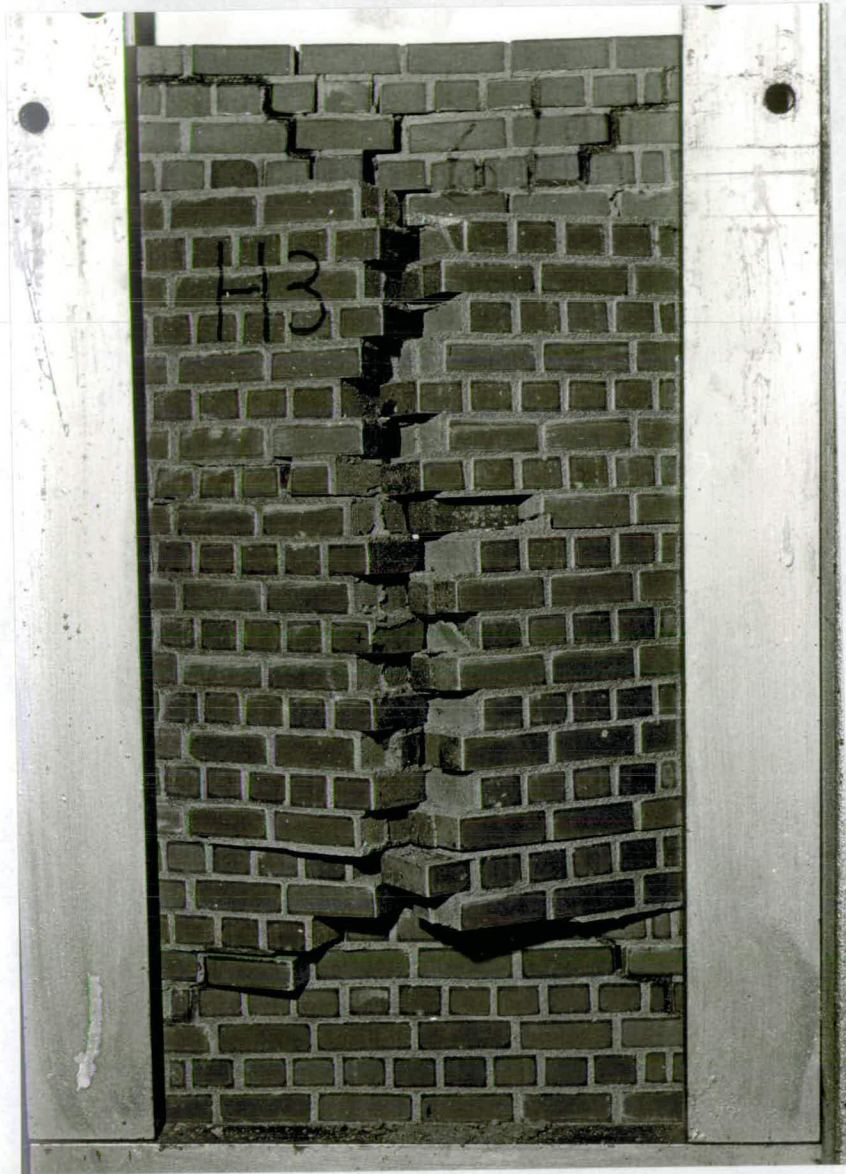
FAILURE OF WALL H3 - 4 SIDES SUPPORTED
